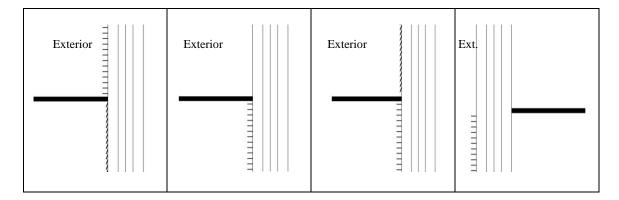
Split system detail section: trials 1 - 4, respectively. O: Outside Orientation.
